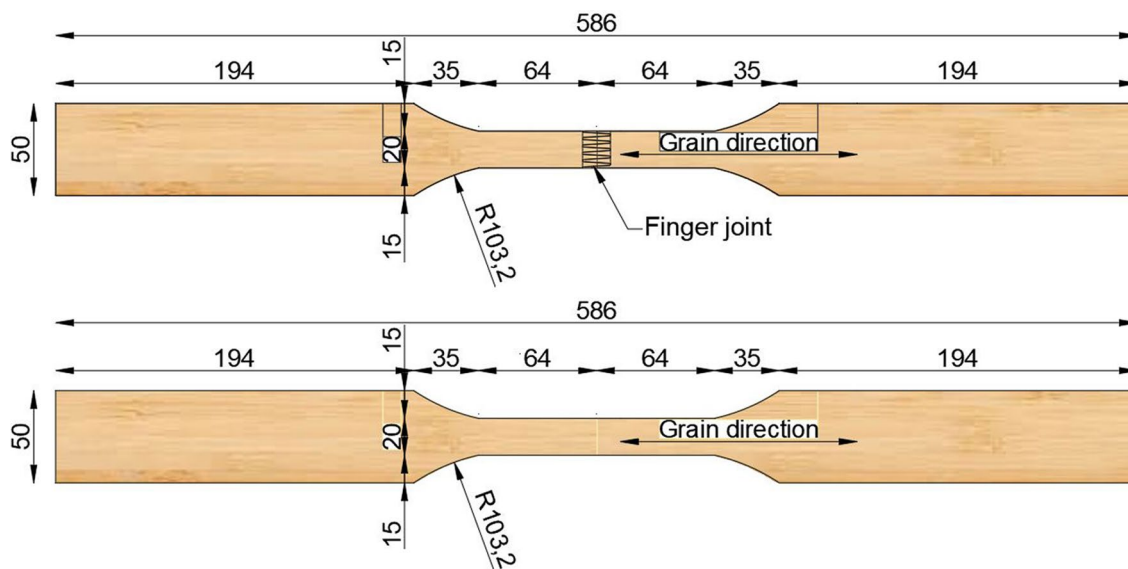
Geometry of the tensile poplar specimens with (TF) and without (TT) finger joints. Dimensions in mm
